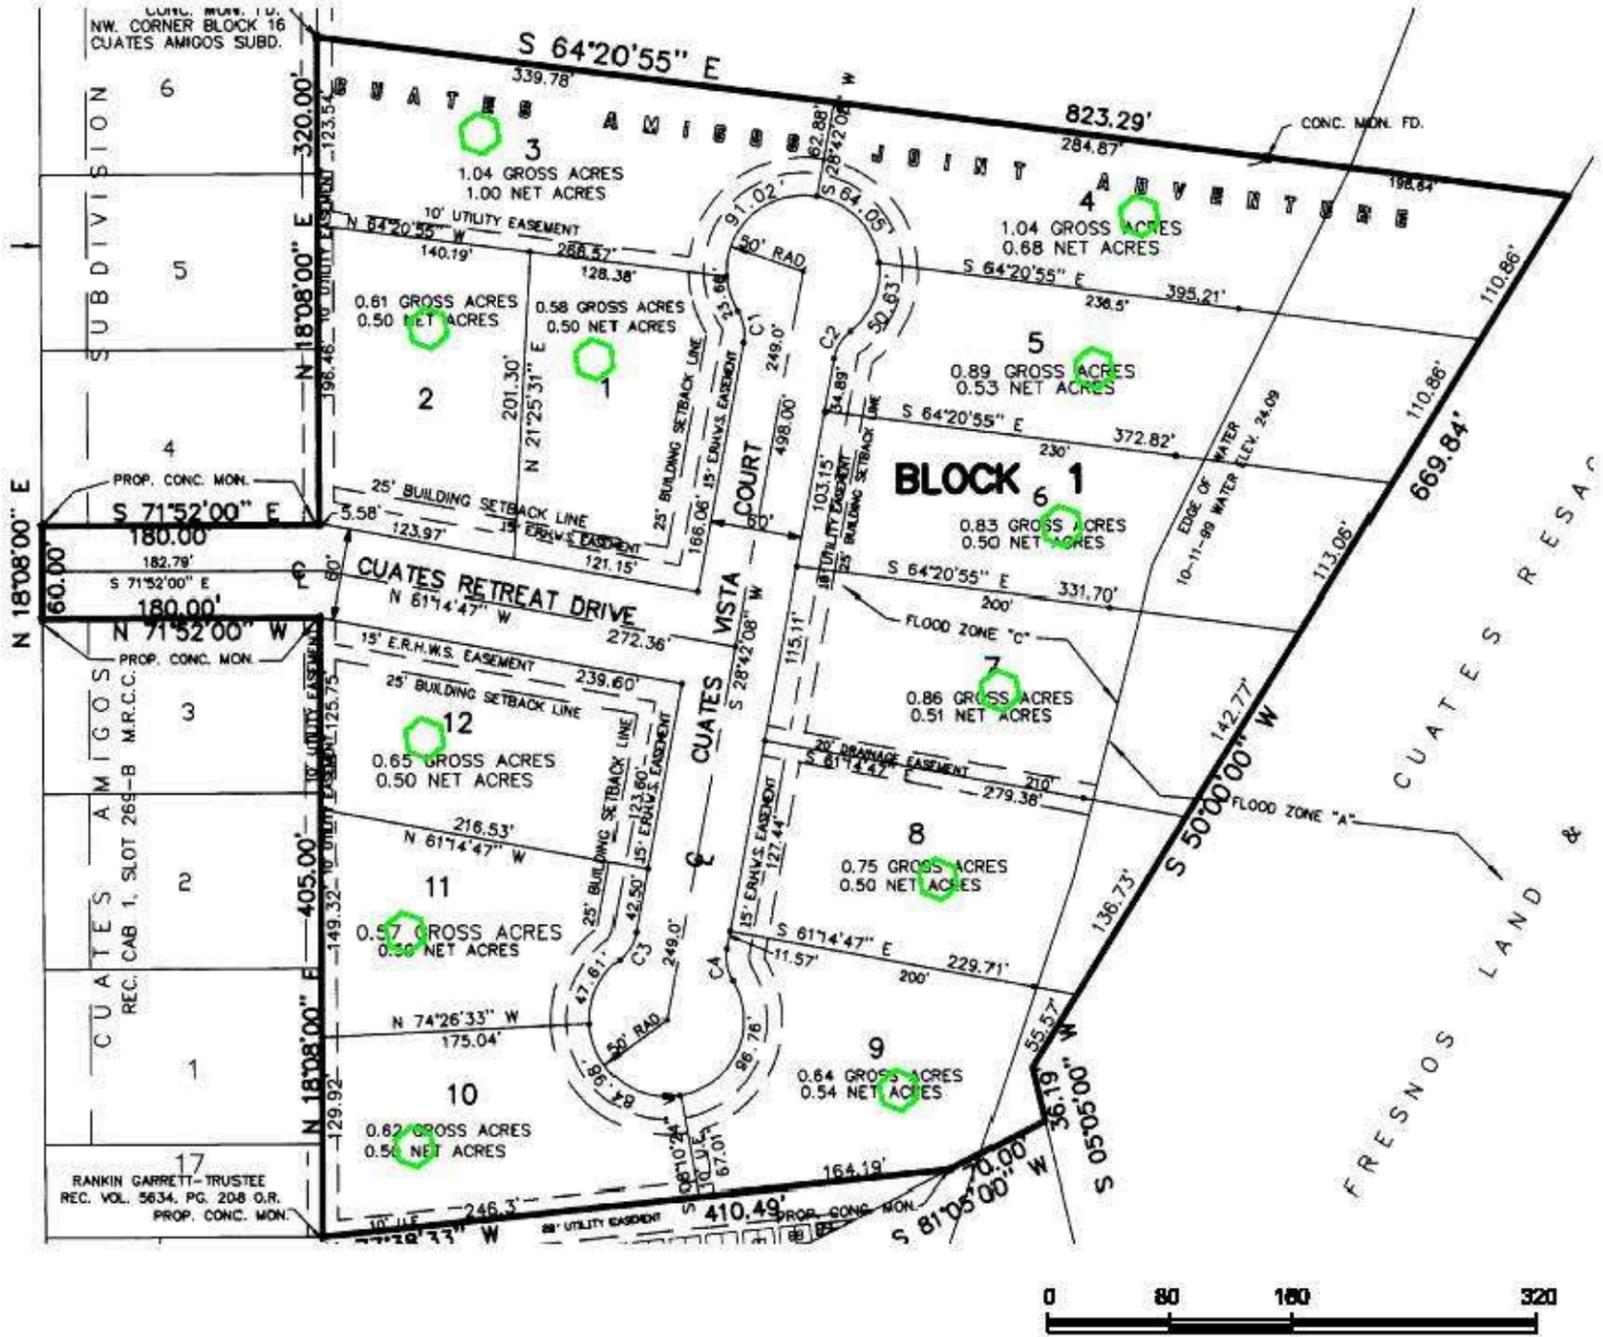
EXHIBIT SHOWING EXISTING SUBDIVISION WITH ON-SITE SEWAGE FACILITIES APPROXIMATE LOCATIONS
